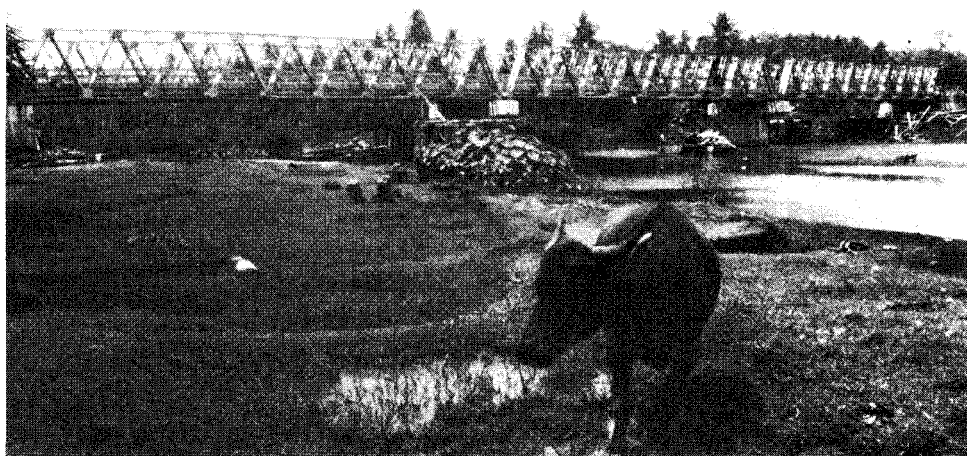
Three span Galvanised Callender-Hamilton Type B15 Bridge under construction in a remote area of Indonesia. The simply supported spans were necessitated by the earthquake potential of the area. The centre span floated into position by barge. See sections 3.2 and 3.3
